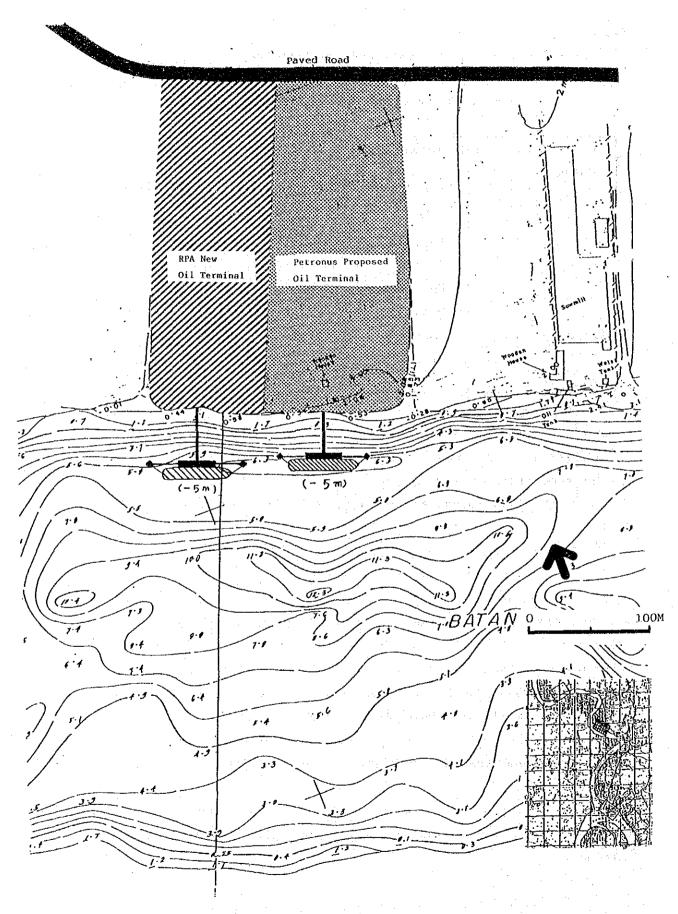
New Oil Terminal Site and plan for New Oil Jetty
